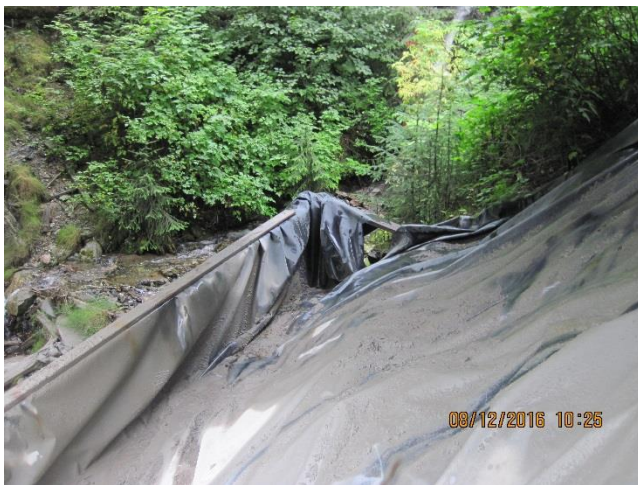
A liner underneath the Killer Creek Bridge (Mill side).
